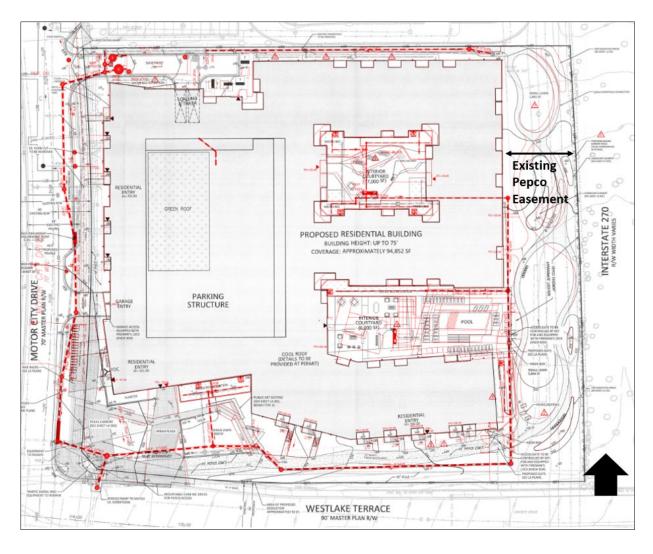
Proposed Redline Changes Site Plan No. 82009014C
